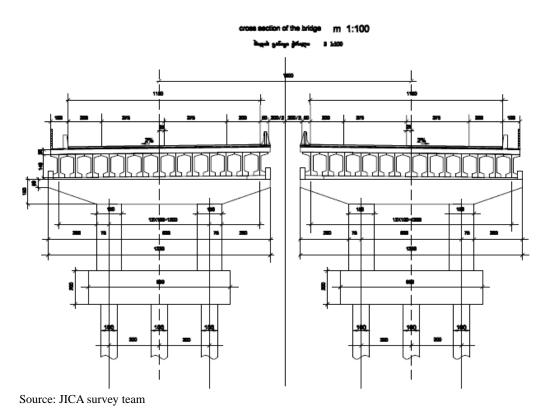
Standard Cross Section (Bridge Section – Completed)
